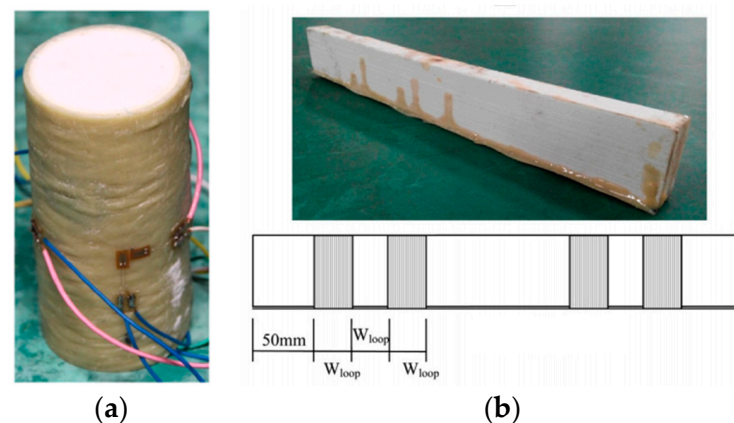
Applications of FRP sheet reinforcement in printed concrete members: (a) printed concrete column wrapped by FRP sheets and (b) printed concrete beam looped by FRP sheets [66].
